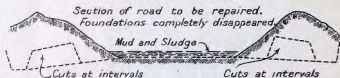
TYPICAL SECTION OF SUNKEN COUNTRY ROAD.
